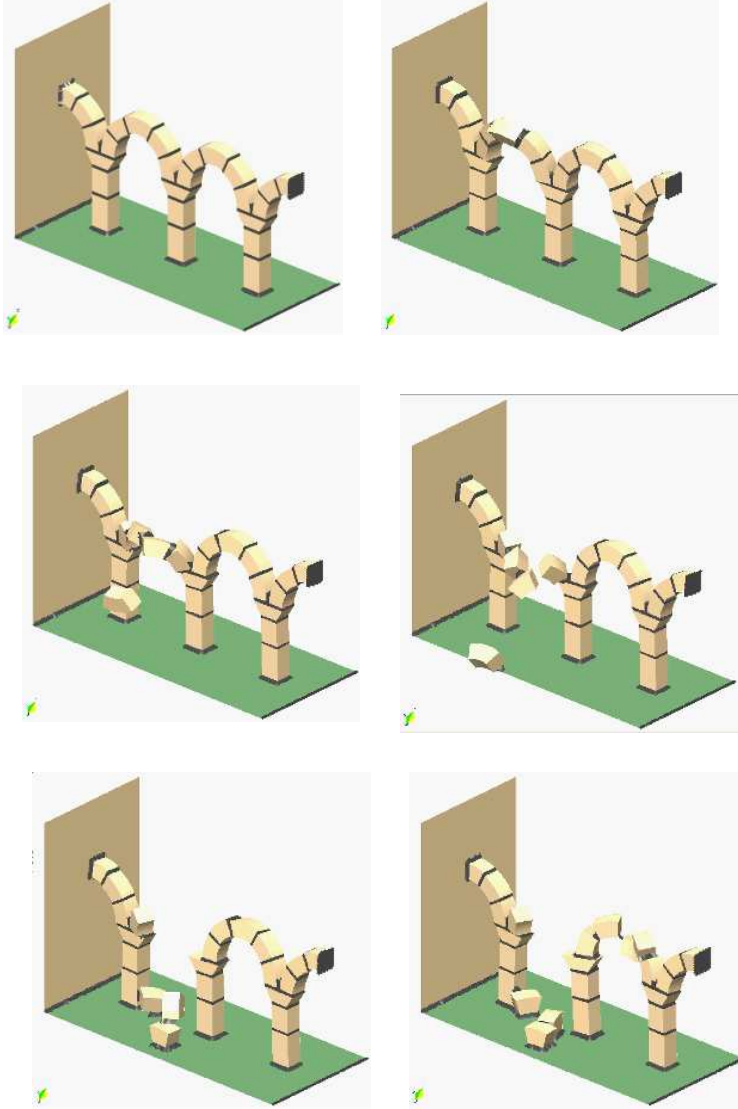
Failure of an arch formed by stone blocks under seismic loading
